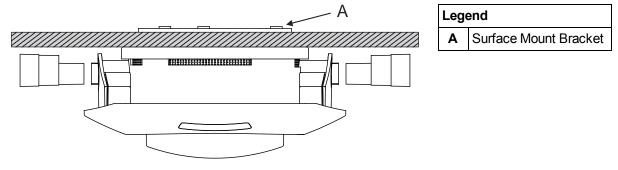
Mount on suspended Ceiling Tile with no Junction Box
